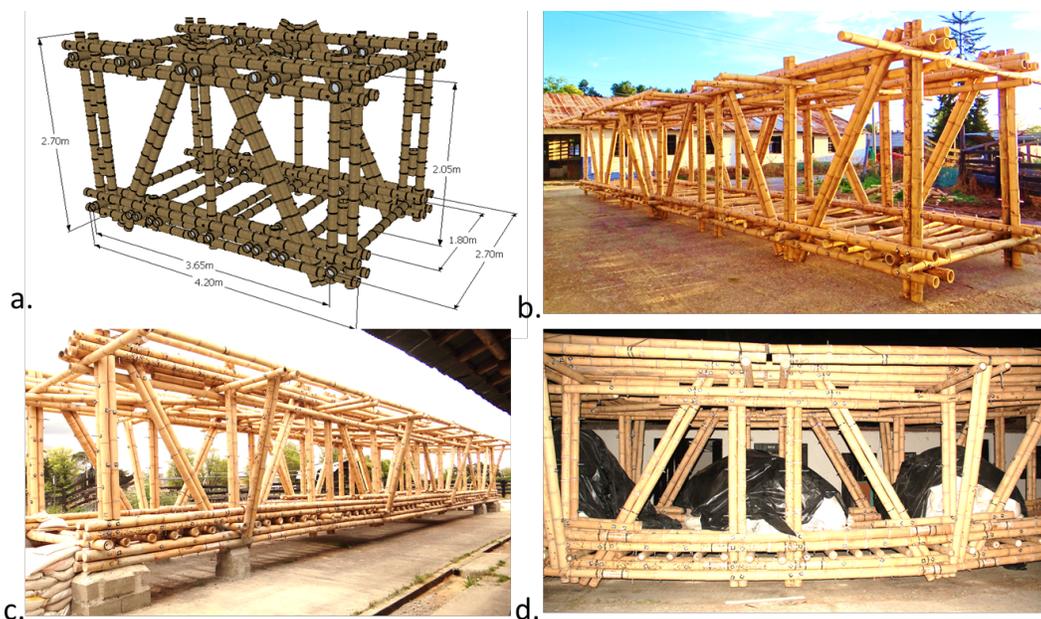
Modular bridge a. Proposed model, b.,c.Real scale prototype of the bridge, d. Load Test
